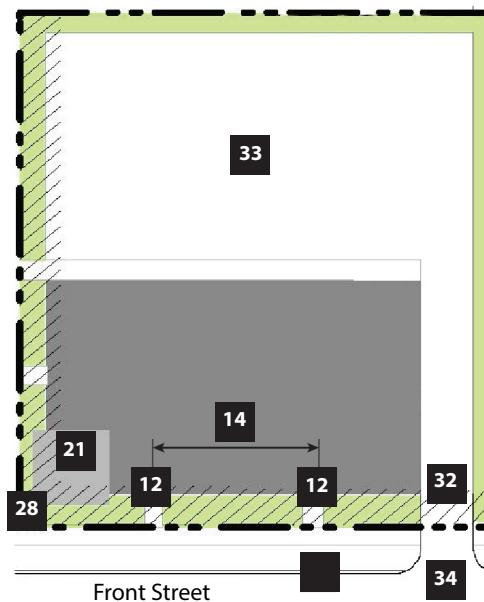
General building siting diagram shown with corner tower and rear vehicular access. Not to scale.
